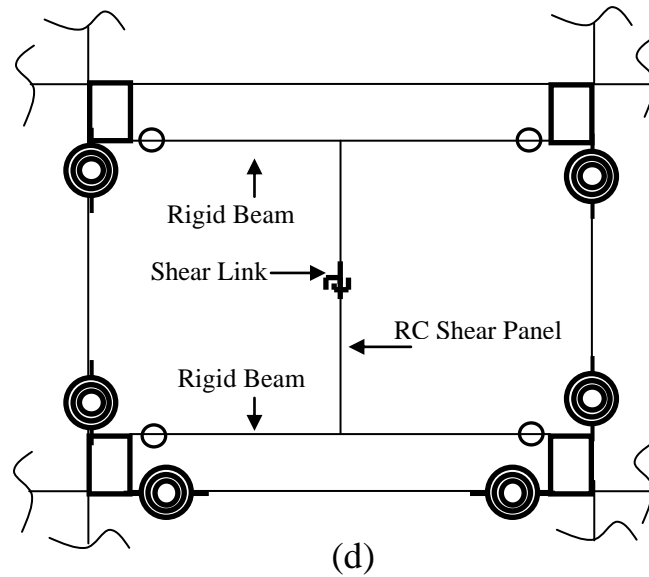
Structural model of the school building retrofitted with the conventional method
